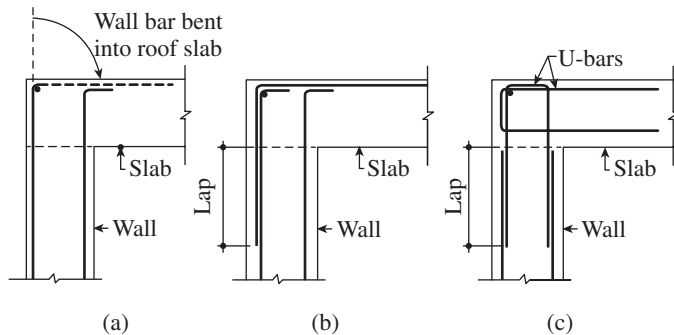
Splices at top of walls (a) Wall bars bent into roof slab (b) Wall and slab bars bent into one another (c) Use of U-bars to connect wall and slab
